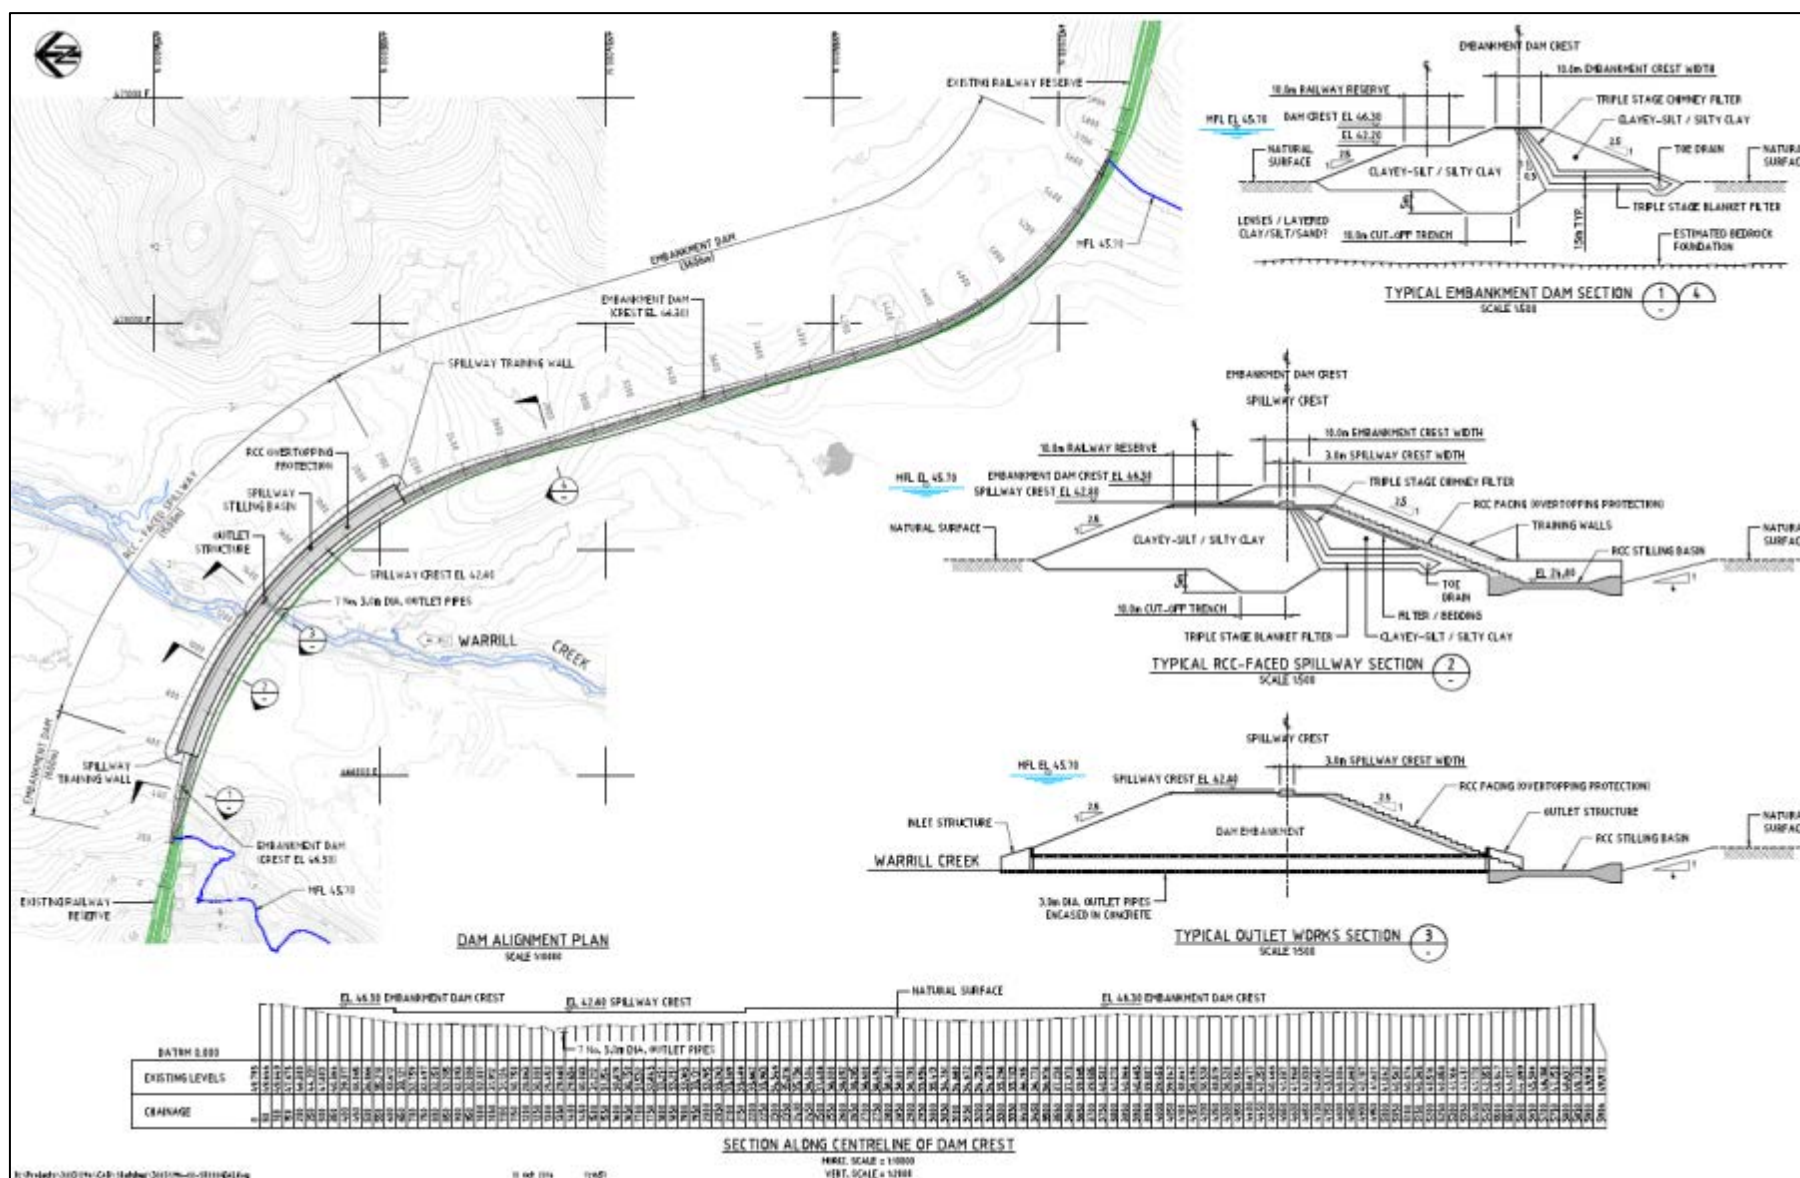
General arrangement and typical cross sections for potential flood mitigation dam, Option B2 - lower Warrill Creek AMTD 14.6 km
